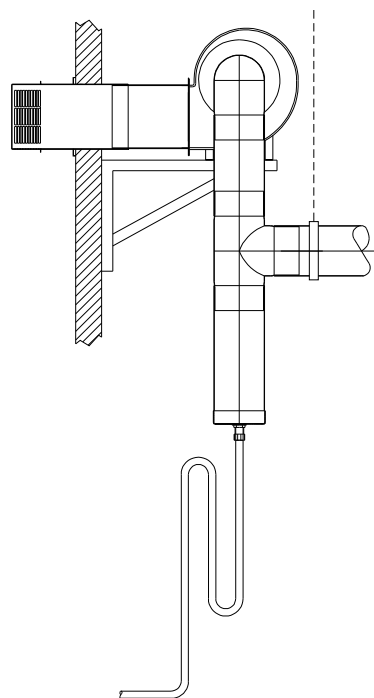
Stainless Steel Telescopic Through The Wall Arrangement (available for Type 'O' and Type '2' fans)
